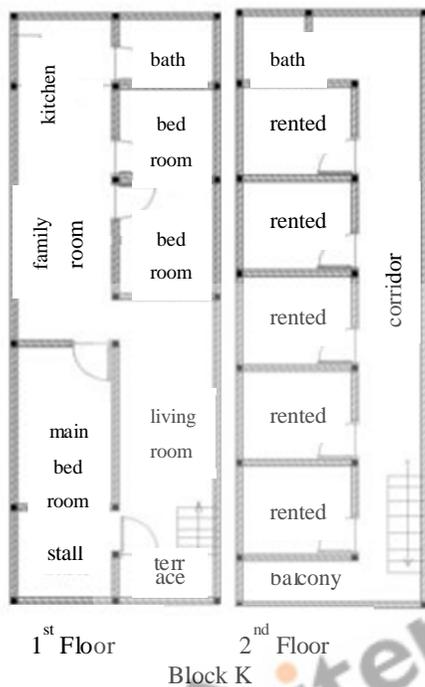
Models of Floor Plan in Two-Storey House (Source: Field Observation, 2014)
